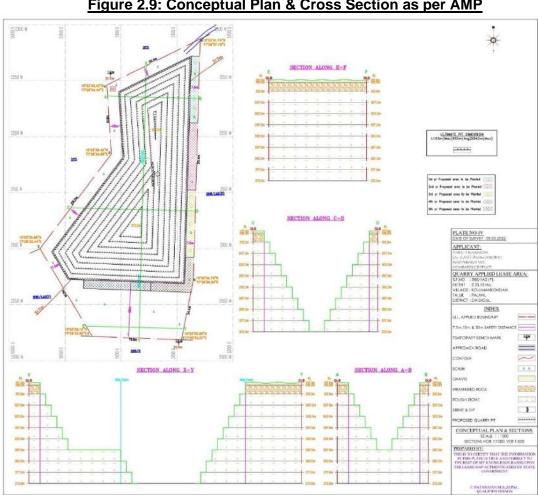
Conceptual Plan & Cross Section as per AMP
